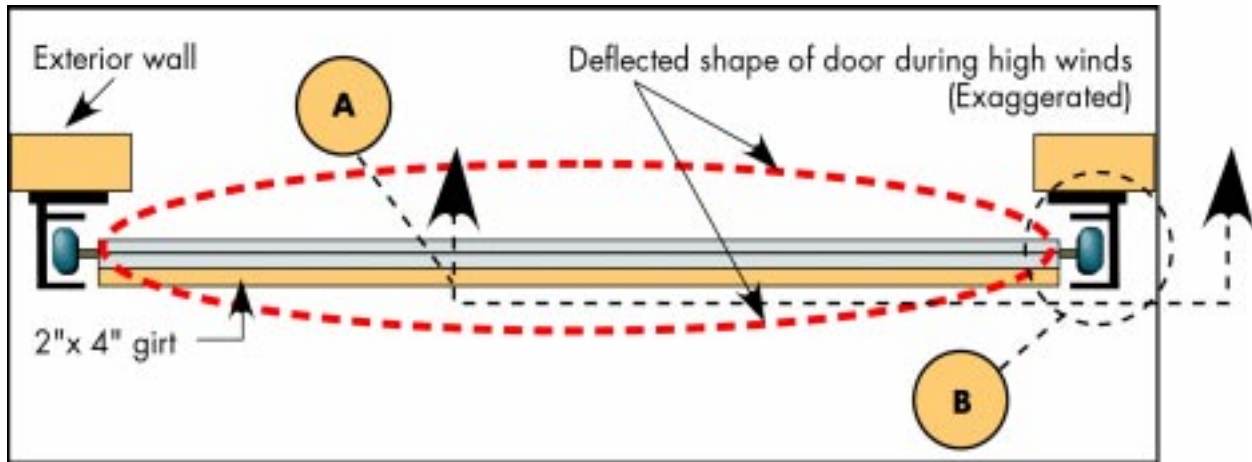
B: Plan view of typical garage door shown in Figure 4-18A.
